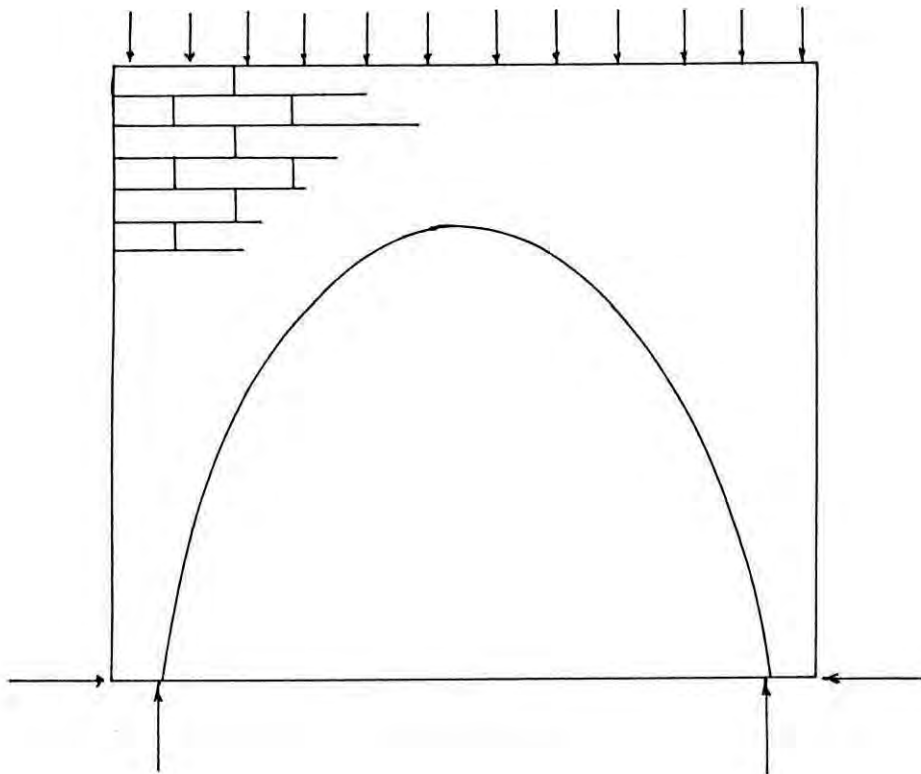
Arching Forces in Wall (Hendry)⁽¹⁾
